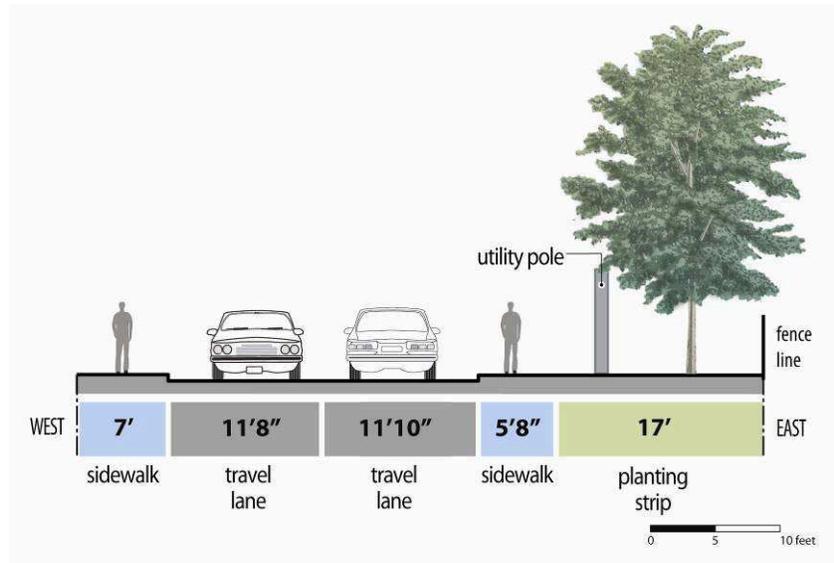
Center Boulevard (Forrest Avenue - Madrone Avenue)
